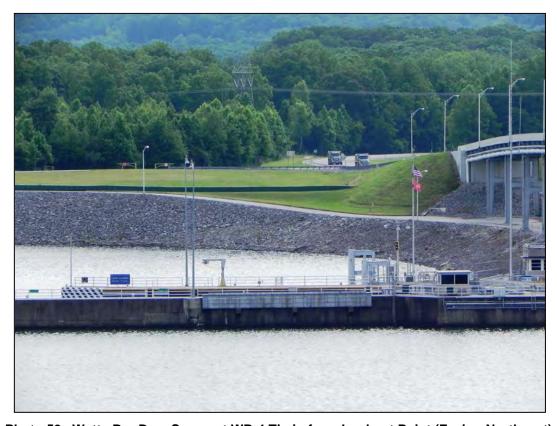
Watts Bar Dam Segment WB-4 Tie-in from Lookout Point (Facing Northeast)
